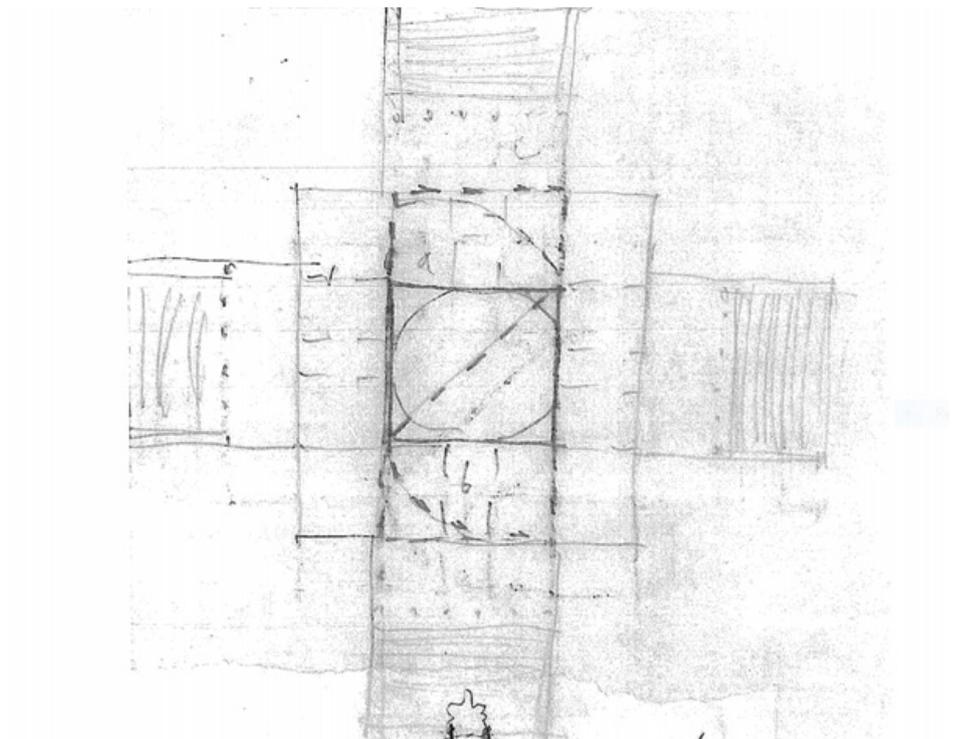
Figure Q: root two rectangles proportioning tool for the plan of the Rotunda, from a sketch by author ("Portrait of a bridge...", 2019)
